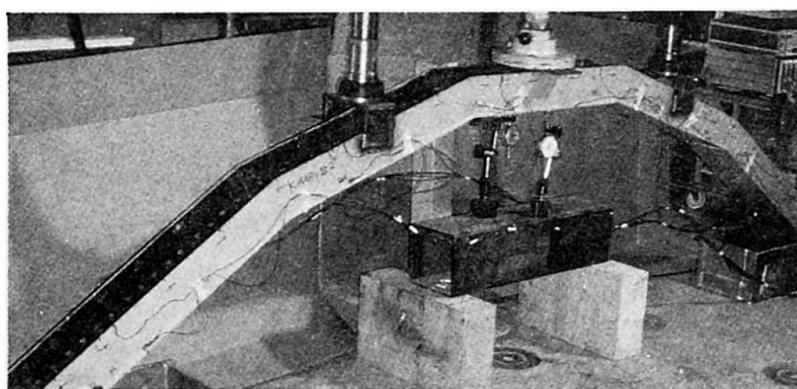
Loading arrangement and the cross-section of the tested arches.
